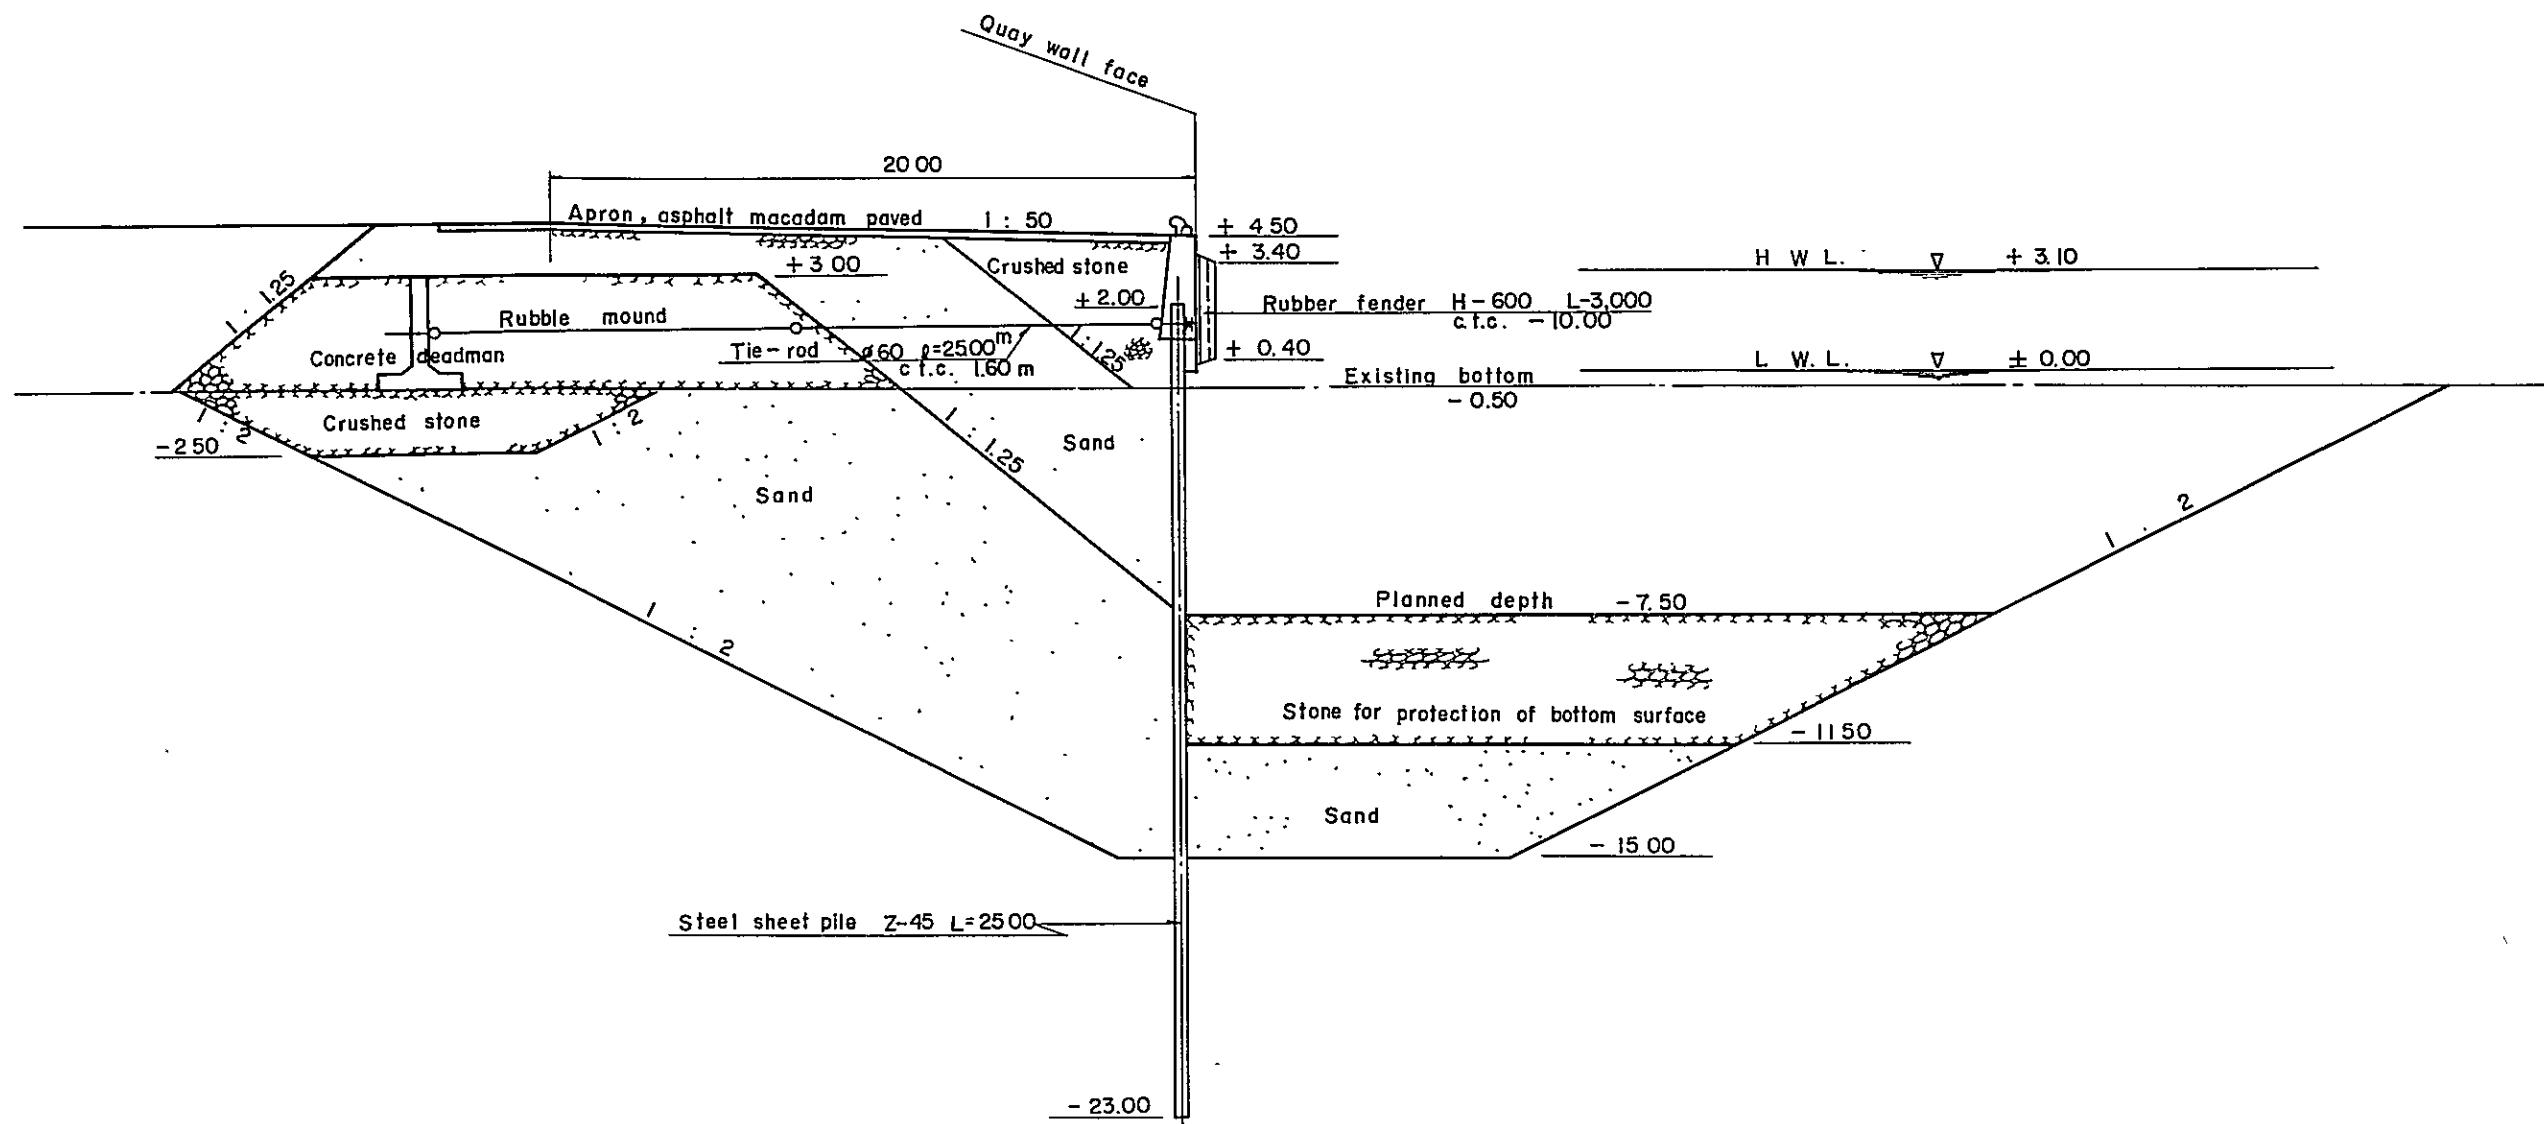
(i.) STANDARD SECTION OF -6.0M SHEET PILE QUAY WALL
